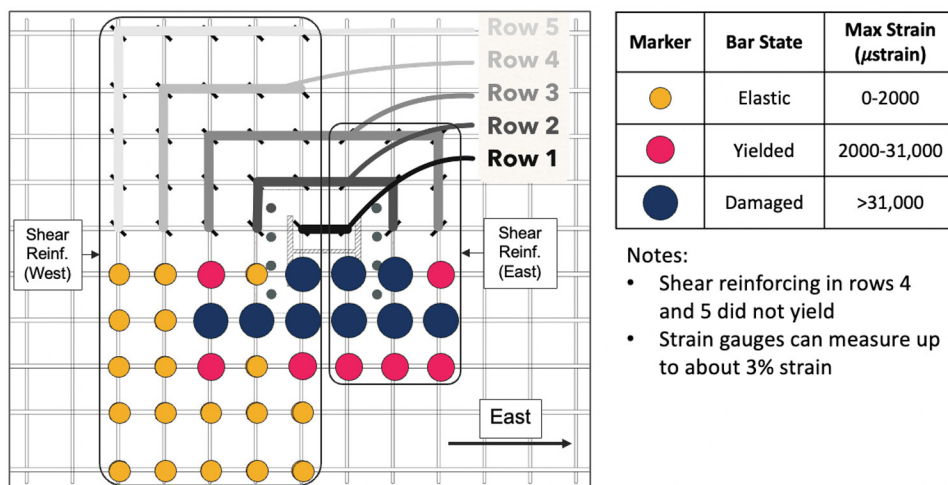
Specimen M02 plan view showing final state of each instrumented bar and subdividing shear reinforcing into rows.
